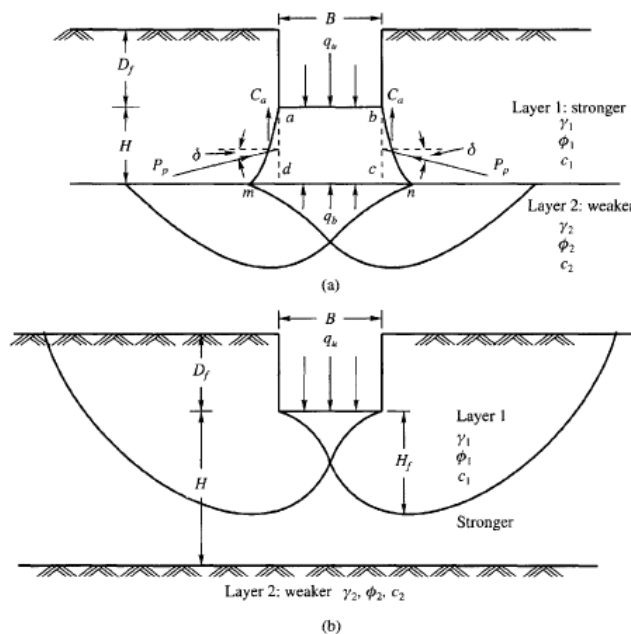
Failure of soil below strip footing under vertical load on strong layer overlying weak deposit (after Meyerhof and Hanna, 1978)
